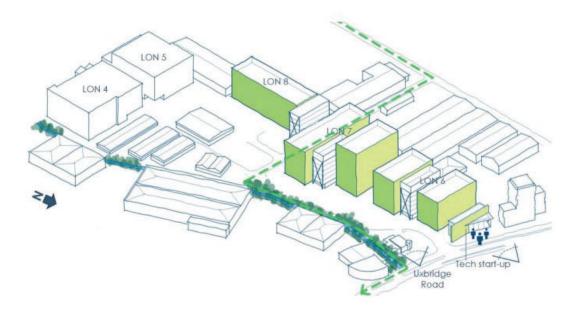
Proposed Site Massing Sketch (please note – a larger version of sketch can be found in the Design and Access Statement)
